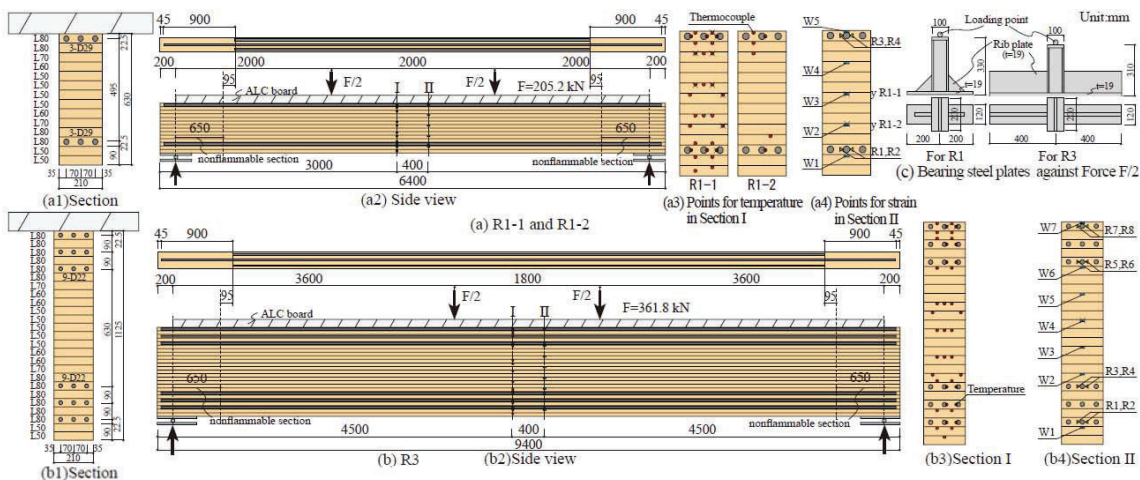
Cross sections and side views of specimens, locations of strain gauge, and thermocouple (Unit: mm)
